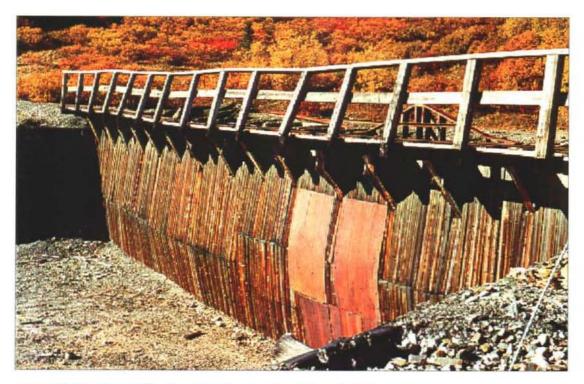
Keno 700. Truck loading trestle at S. end of site.
